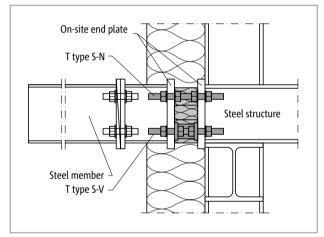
Schöck Isokorb® T Type S for cantilevered steel structures ; including first fix bracket
